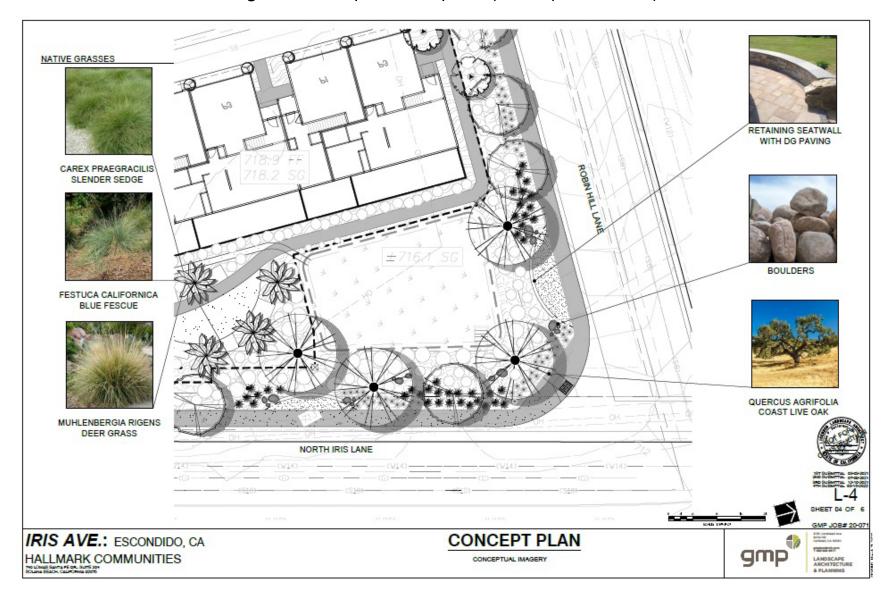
Conceptual Landscape Plan (North Iris/Robin Hill Lane)
